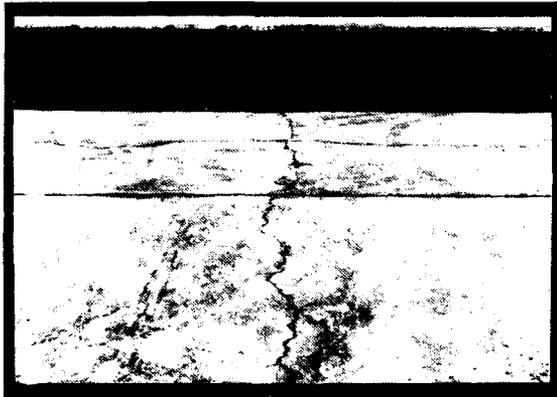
Cracks formed where joints should have been cut to control the cracking. Recommend the cracks be cleaned and sealed.
